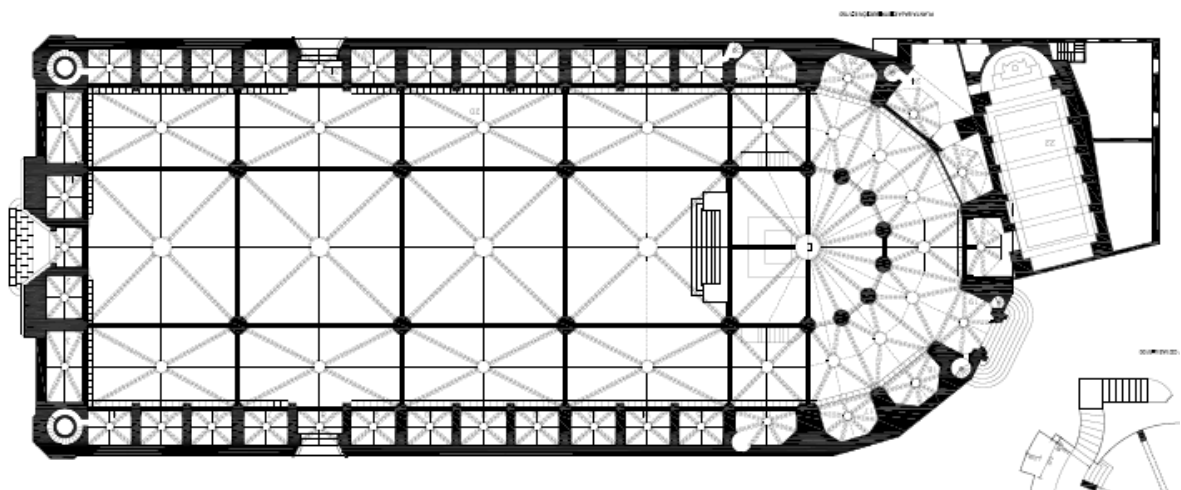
The general plan lay-out of Santa Maria Del Mar (Nieto, A. and Diaz, E., 2008)
